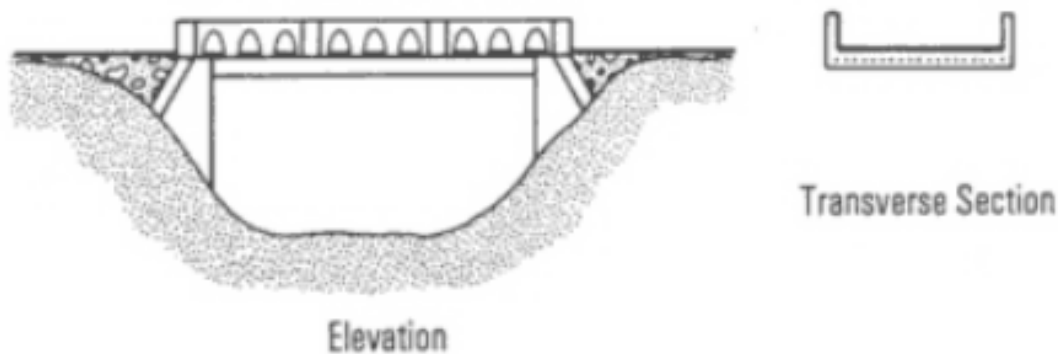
FLAT CONCRETE SLAB BRIDGE.
